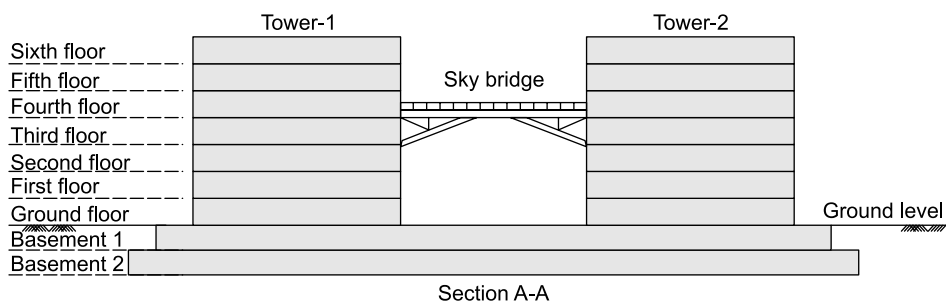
Section of the Example Building Project Fig 16.2 Showing Two Symmetrical Towers.
